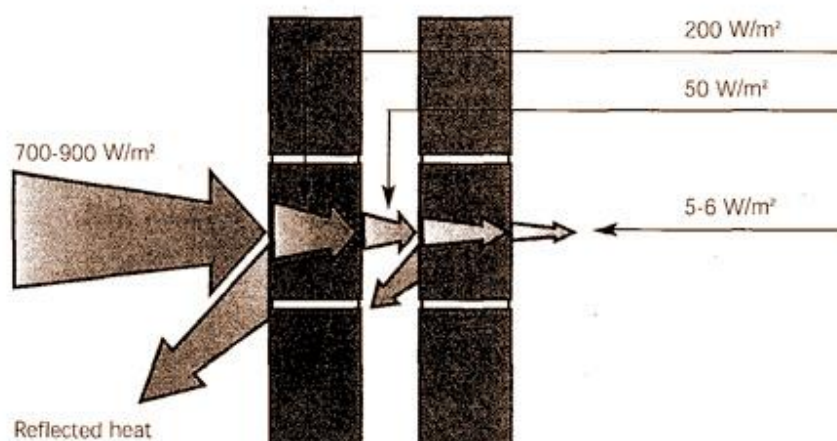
Less than one Percent of Heat penetrates a west-facing Clay Cavity Brick Wall
